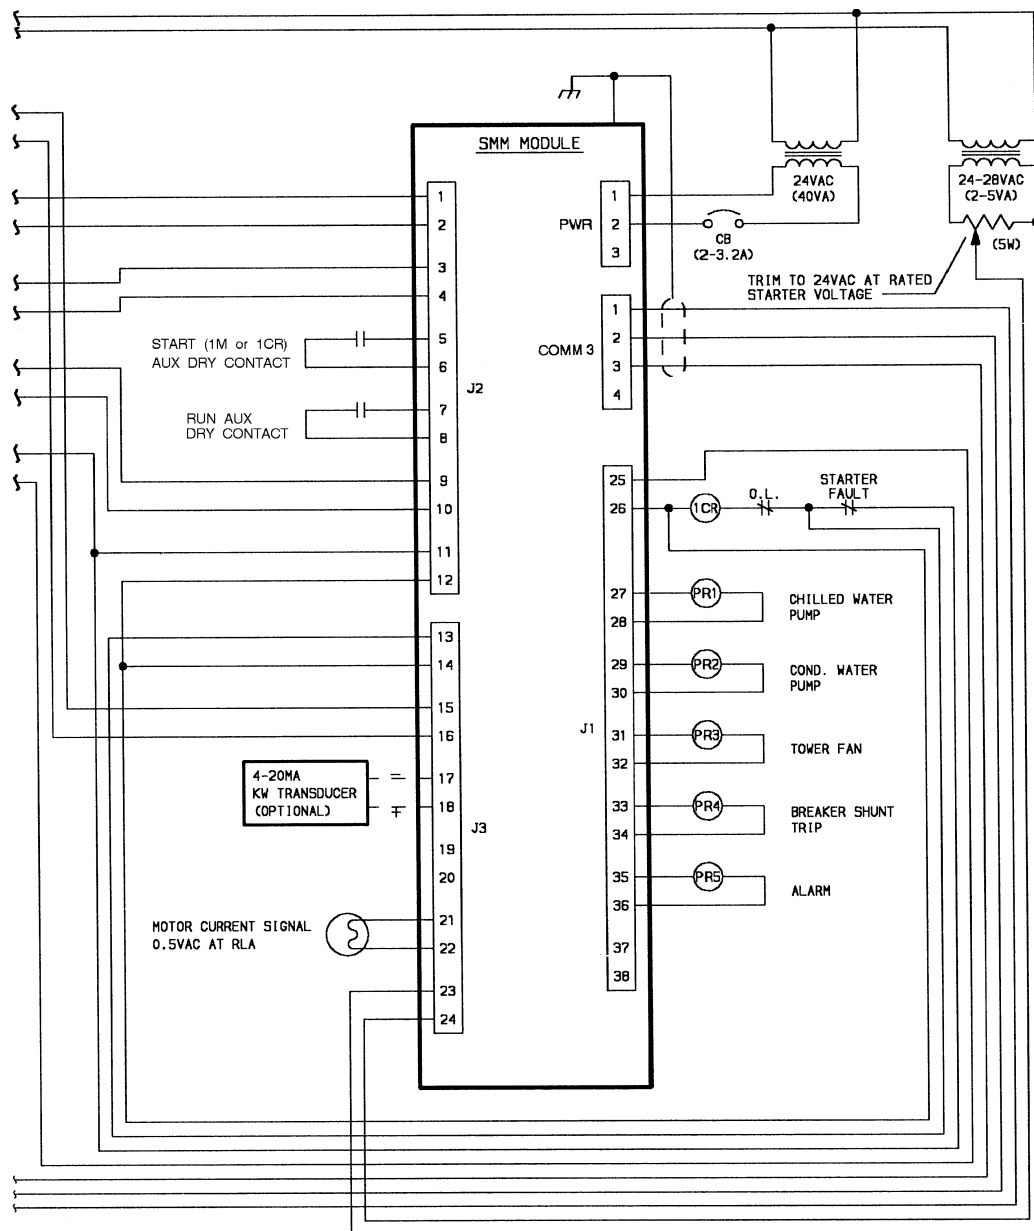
Chiller Power Panel, Starter Assembly, and Motor Wiring Schematic (cont)
